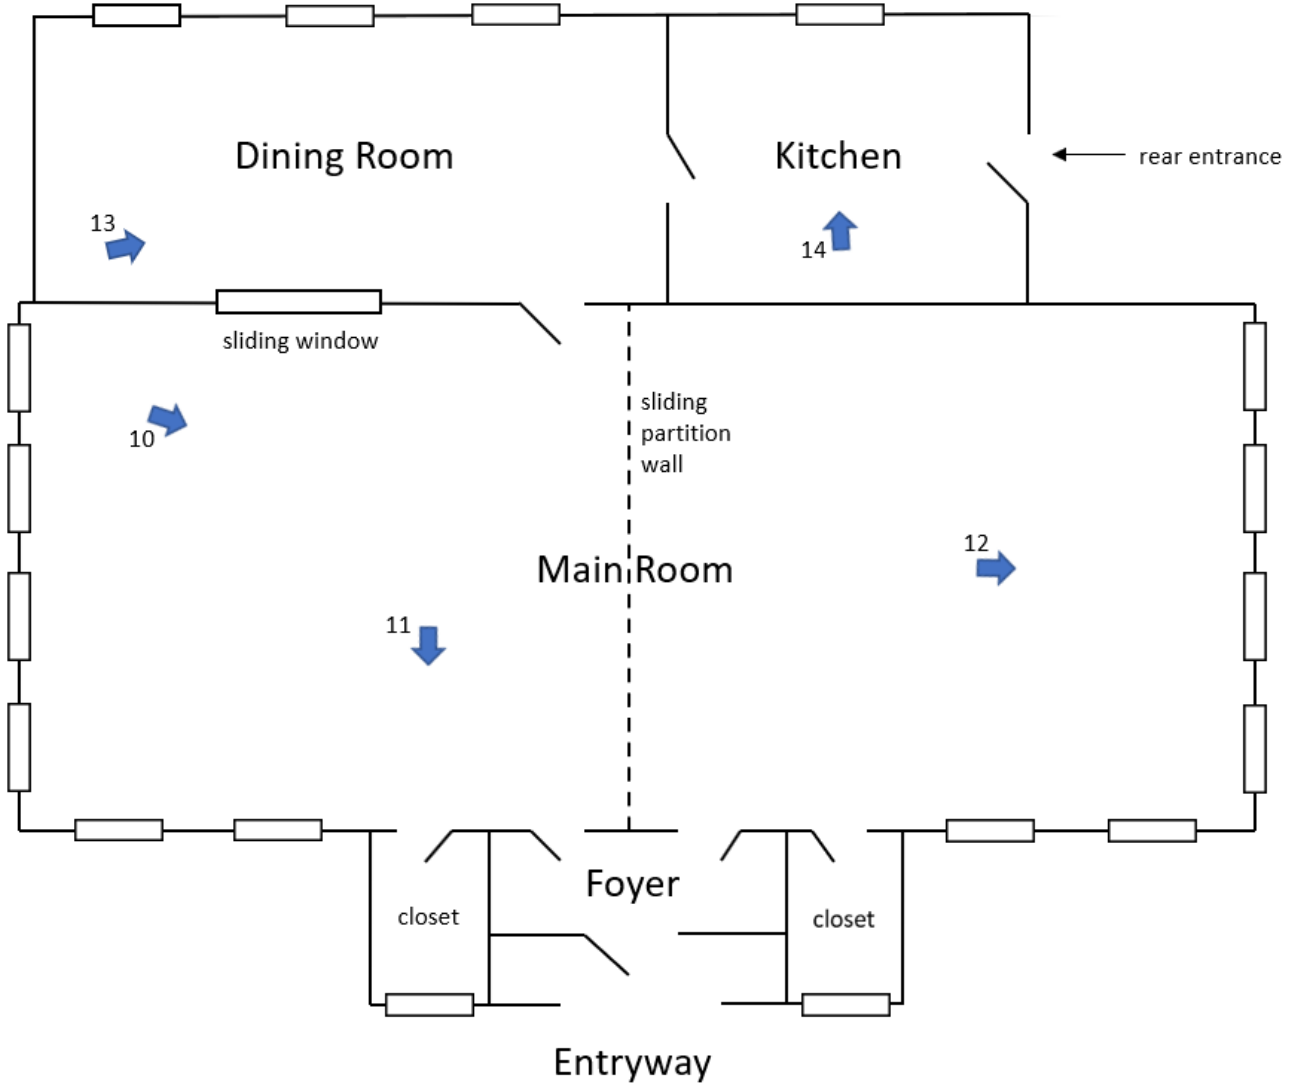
Floor Plan with Photo Vantage Points (not to scale)
